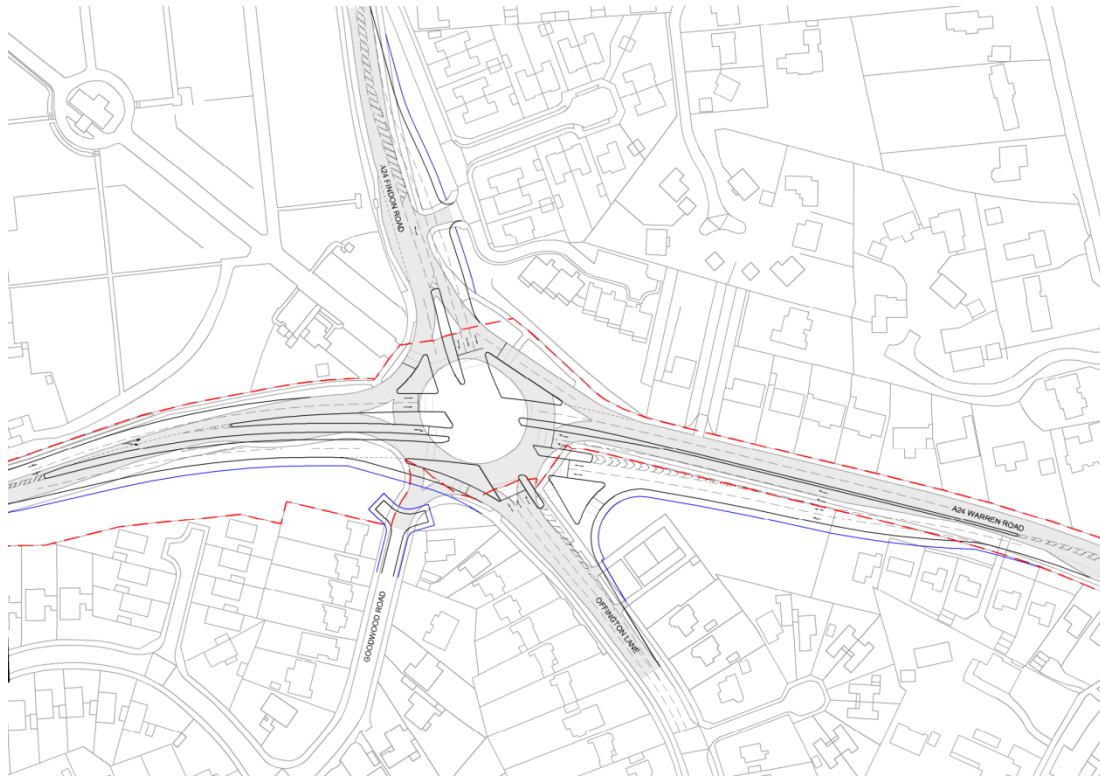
Offington Corner Junction - A2 Findon Road/ Offington Lane (Durrington Cemetery)
